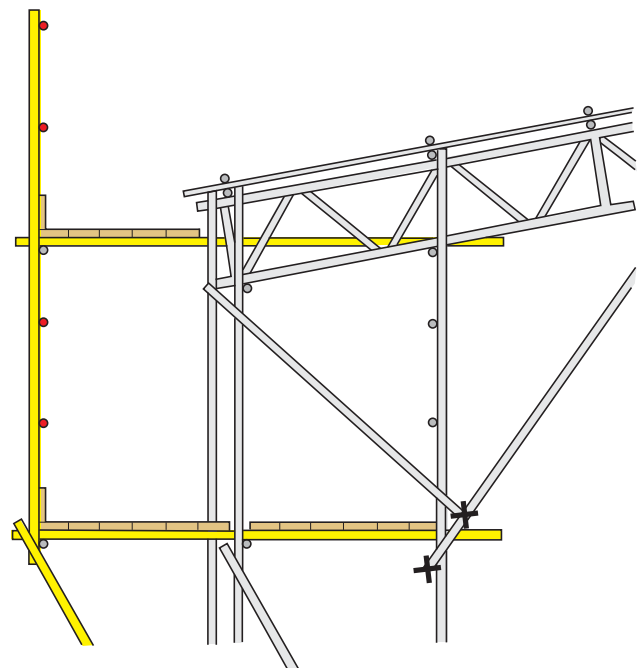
An example of traditional temporary roof erected in-situ with perimeter edge protection and safe access to the roof surface via a cantilevered eaves walkway.
